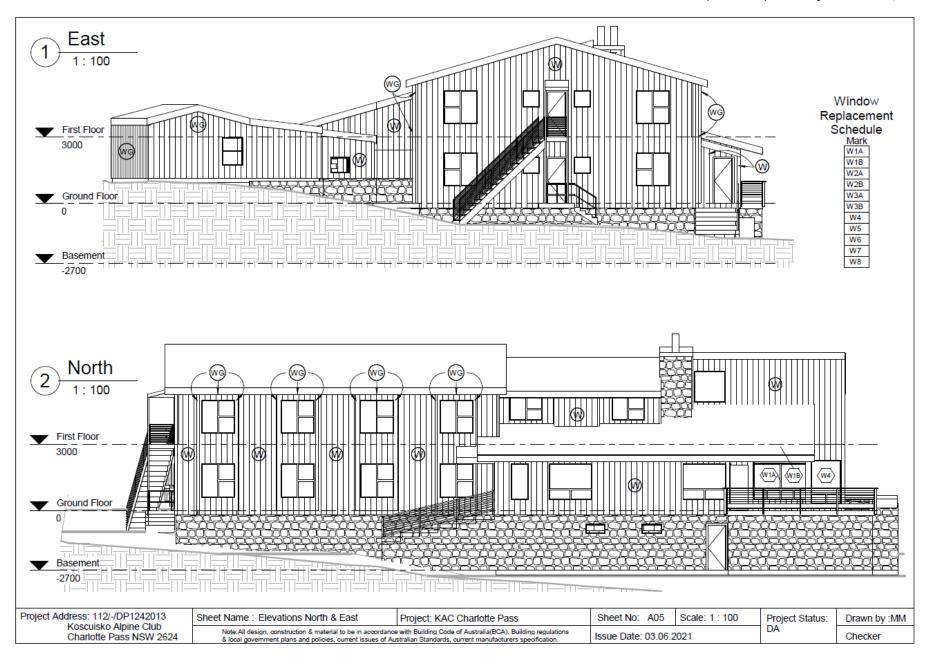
East and north elevations showing cladding replacement (W and WG) and window replacements
